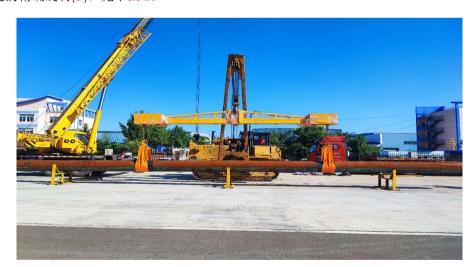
Hydraulic drive pipe handling equipment 图 2. 液压驱动转管吊具
